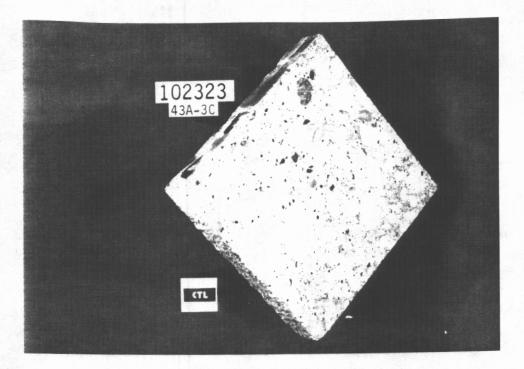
LAPPED SLICE SIDE OF CONCRETE SPECIMEN NO. 21-1A.
